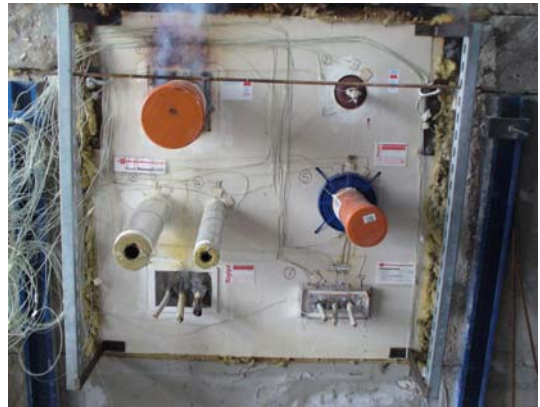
Small scale fire tests assembly (setup 2 - EI90)
